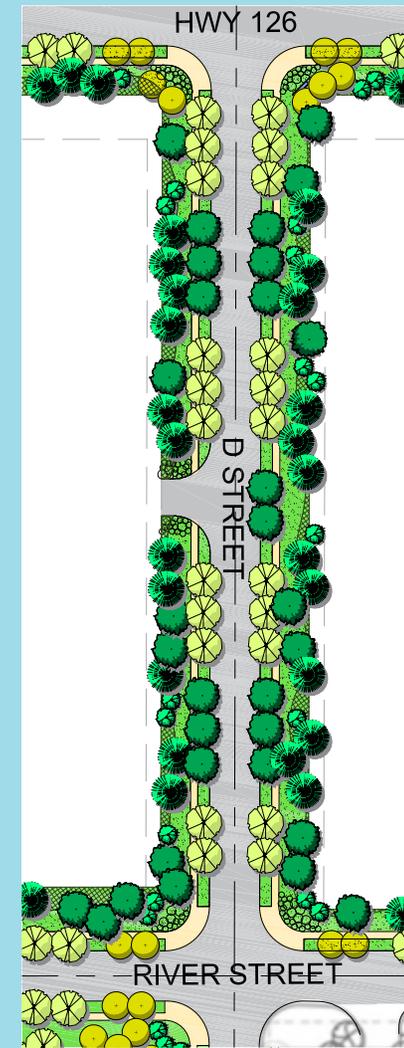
PLAN VIEW OF TYPICAL C STREET, D STREET, AND E STREET
